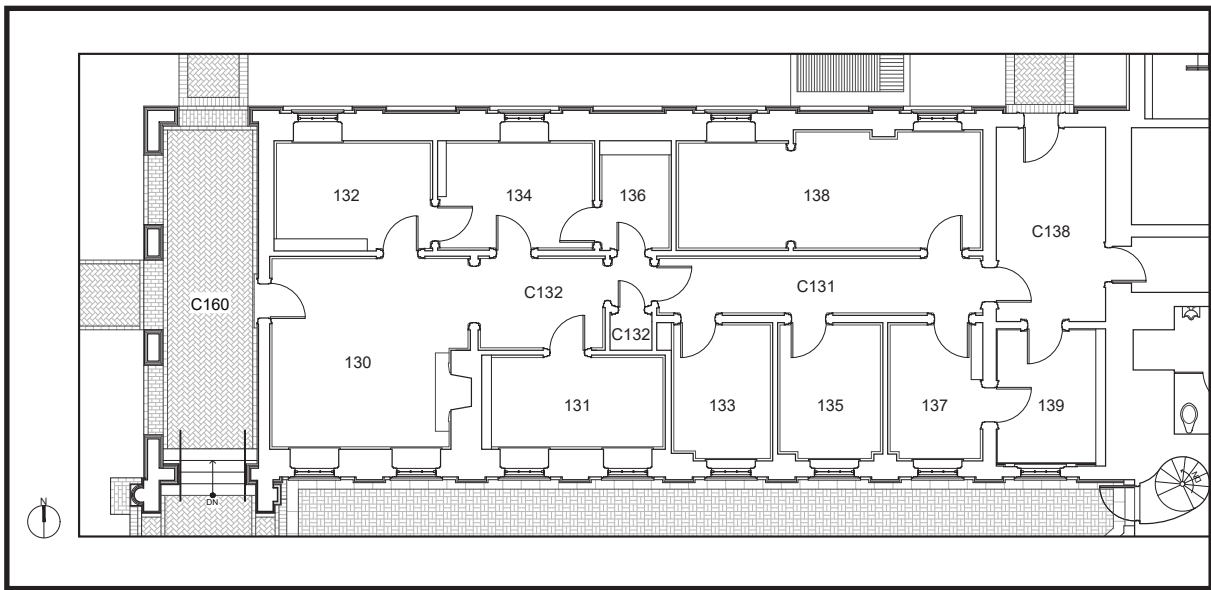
Detail of ground-floor plan of the northwest wing (not to scale).
